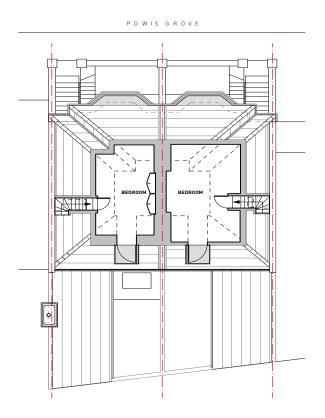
Proposed Plan of 8 & 9 Powis Grove Illustrating the Proposed Villa Symmetry
